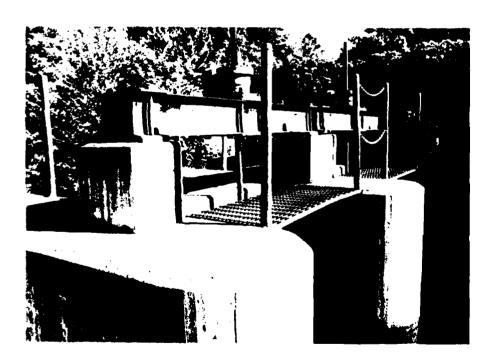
View of control (gate) mechanism at outlet works structure.
